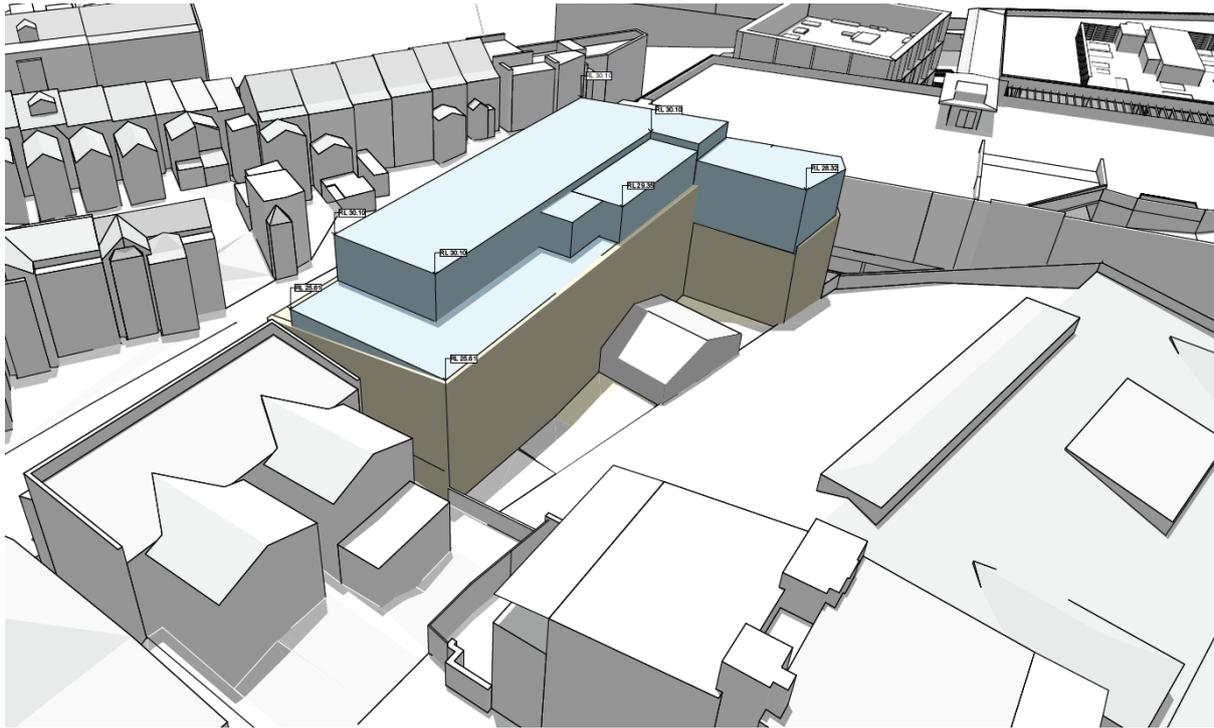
3D diagram of the proposed building envelope looking north towards the side and rear elevations, with third storey height limited to highest point of existing warehouse building and fourth storey setback 6 metres from the side boundary and 5.5 metres from part of the rear boundary.
